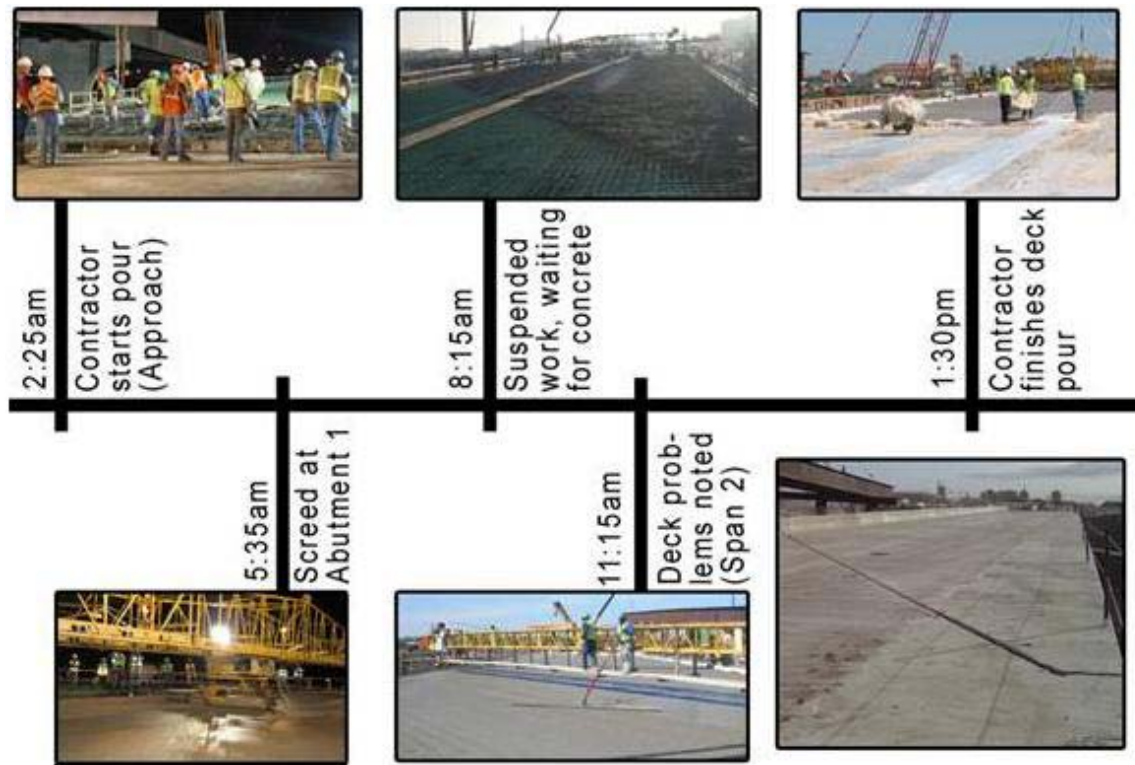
Timeline of Concrete Deck Placement [Fasl 2008]
